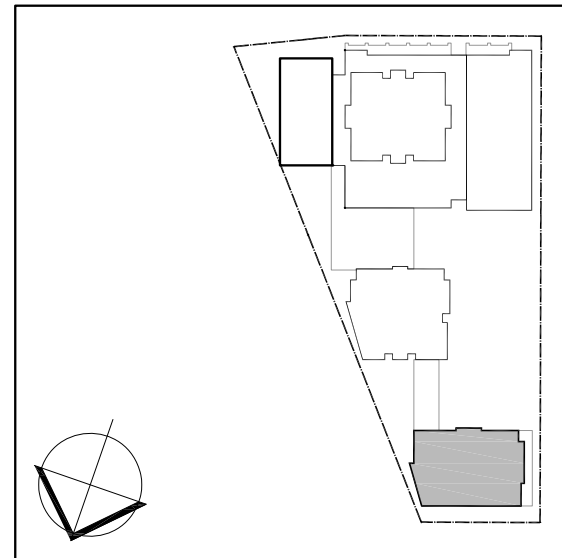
Podium Floor Plan (Floors 2 to 4), Residential Tower 3
